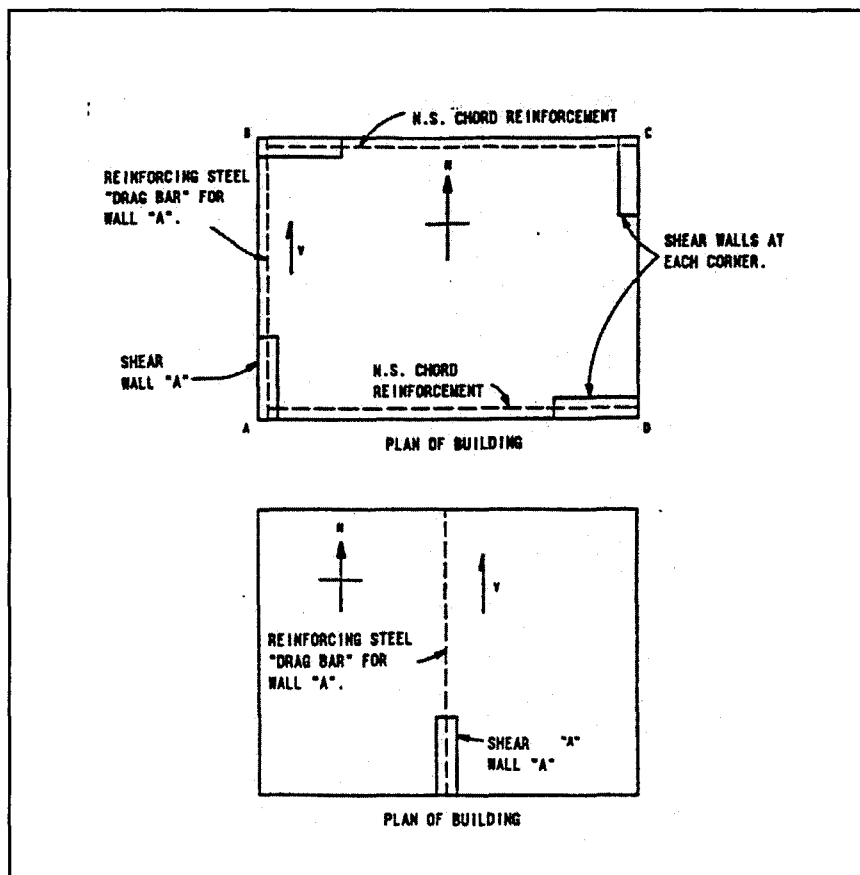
Collector element used to (a) transfer shears and (b) transfer drag forces from diaphragm to shear wall.
